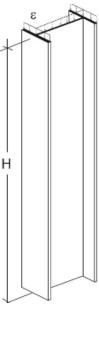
STRUCTURAL DETAIL Page 108
